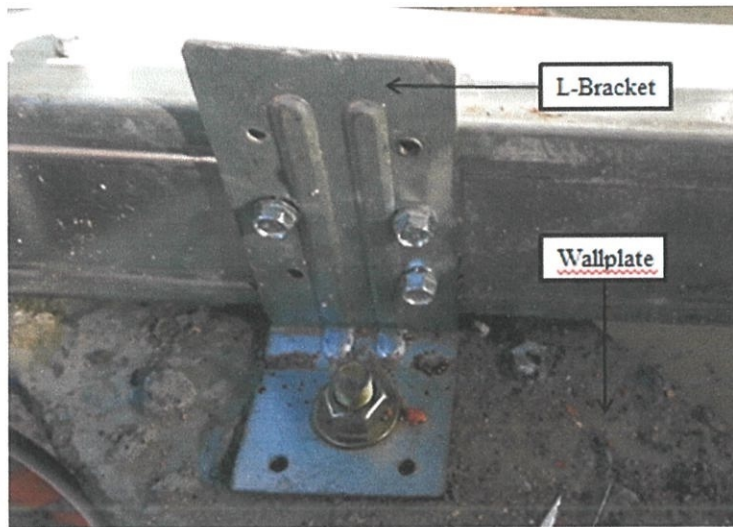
Connection between L-Bracket and Bottom Chord
